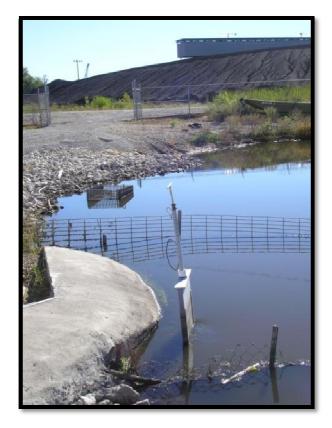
Ash Pond 1 Spillway Location
